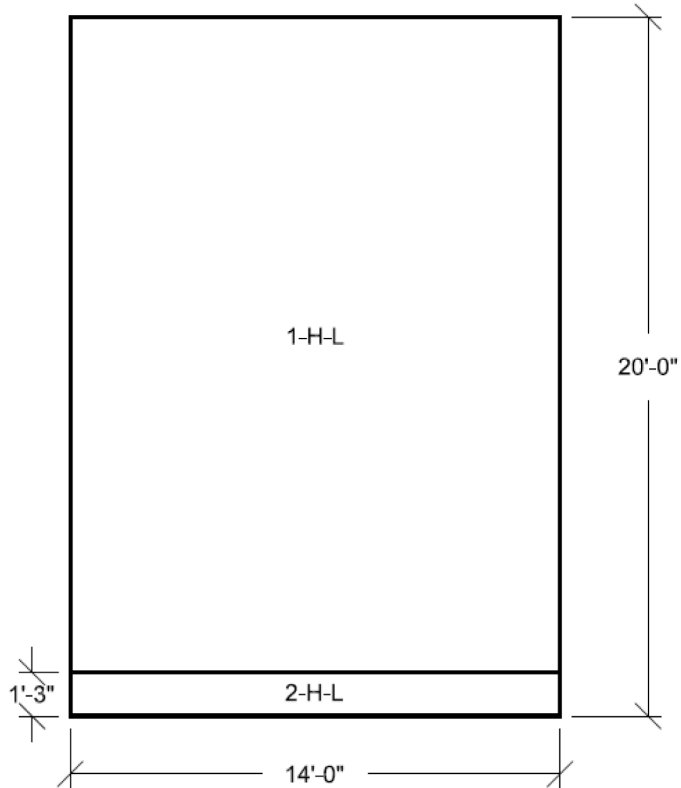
H.6-173 DGFOV Wall 9 Looking From Outside Horizontal Reinforcement Zones Near Side Face
